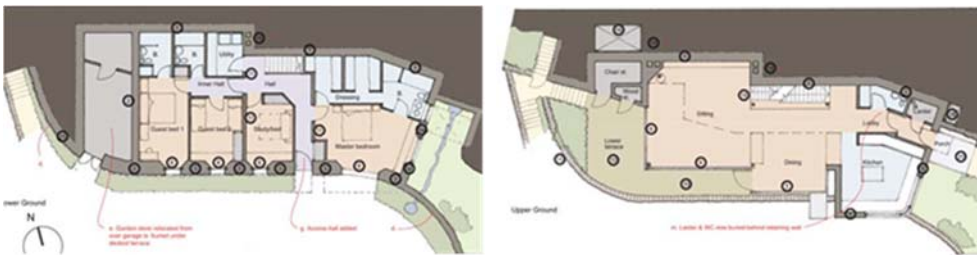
(a) Lower ground floor; and (b) Upper ground floor.
